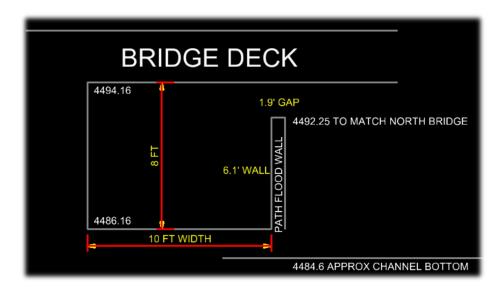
Unfeasible Wall Required under South Bridge to provide same flood protection as existing path under North Bridge
